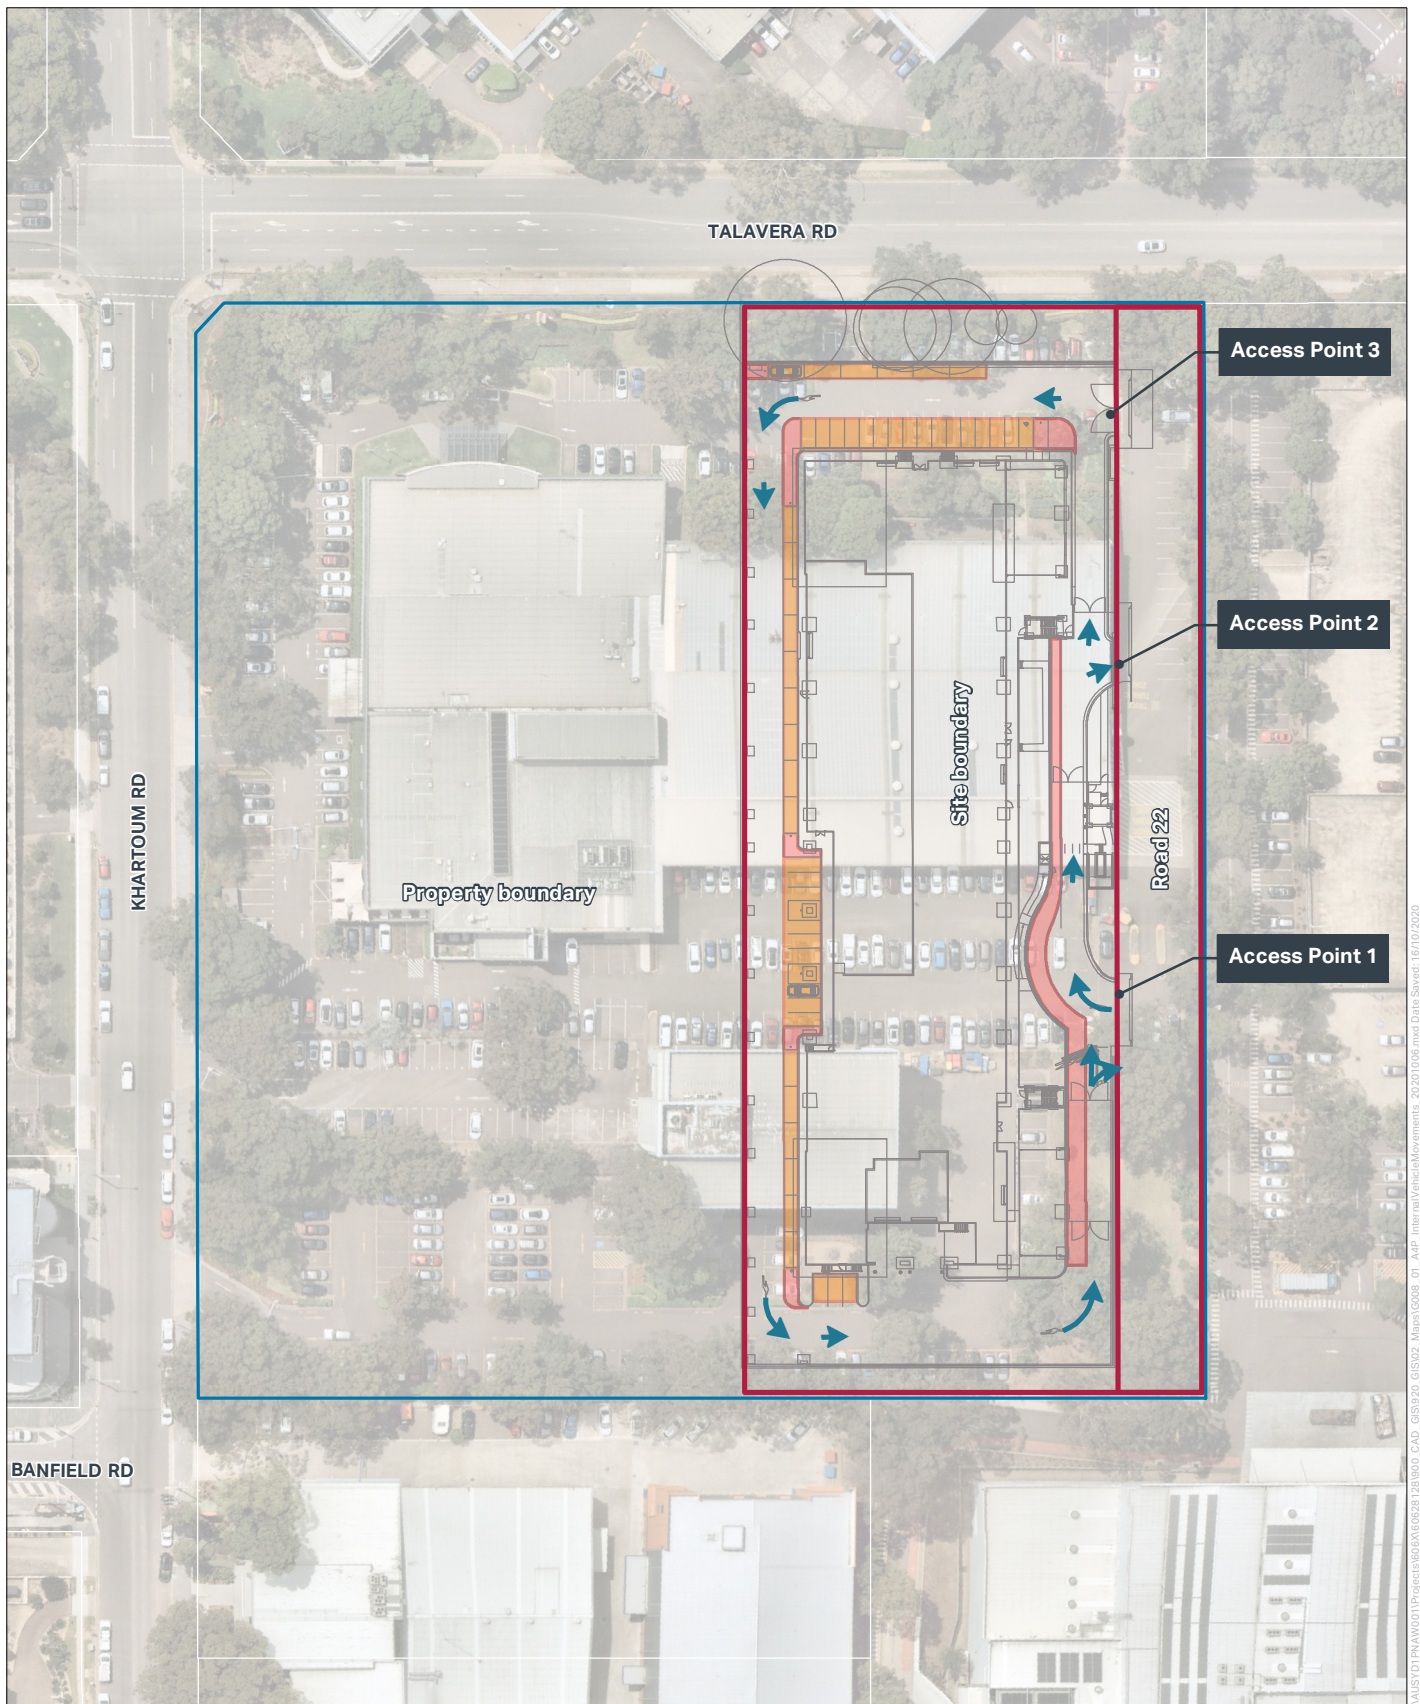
Carparking, internal road layout and active transport facilities for the Proposal
